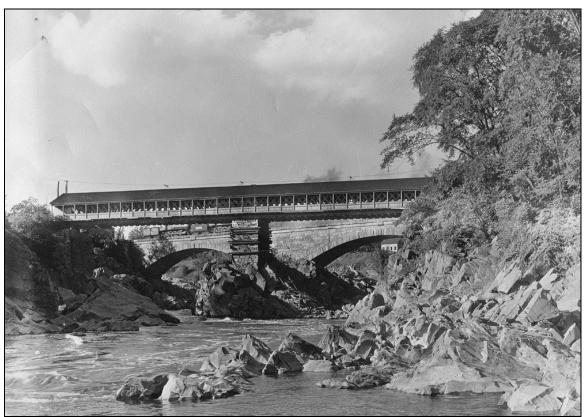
Tucher Bridge, downstream side, shown sometime after construction of the Fitchburg Railroad stone double-arch railroad bridge in 1902 (in background). Note two steam engines, just visible, crossing bridge to North Walpole railroad yard (Cheshire County Historical Society).
